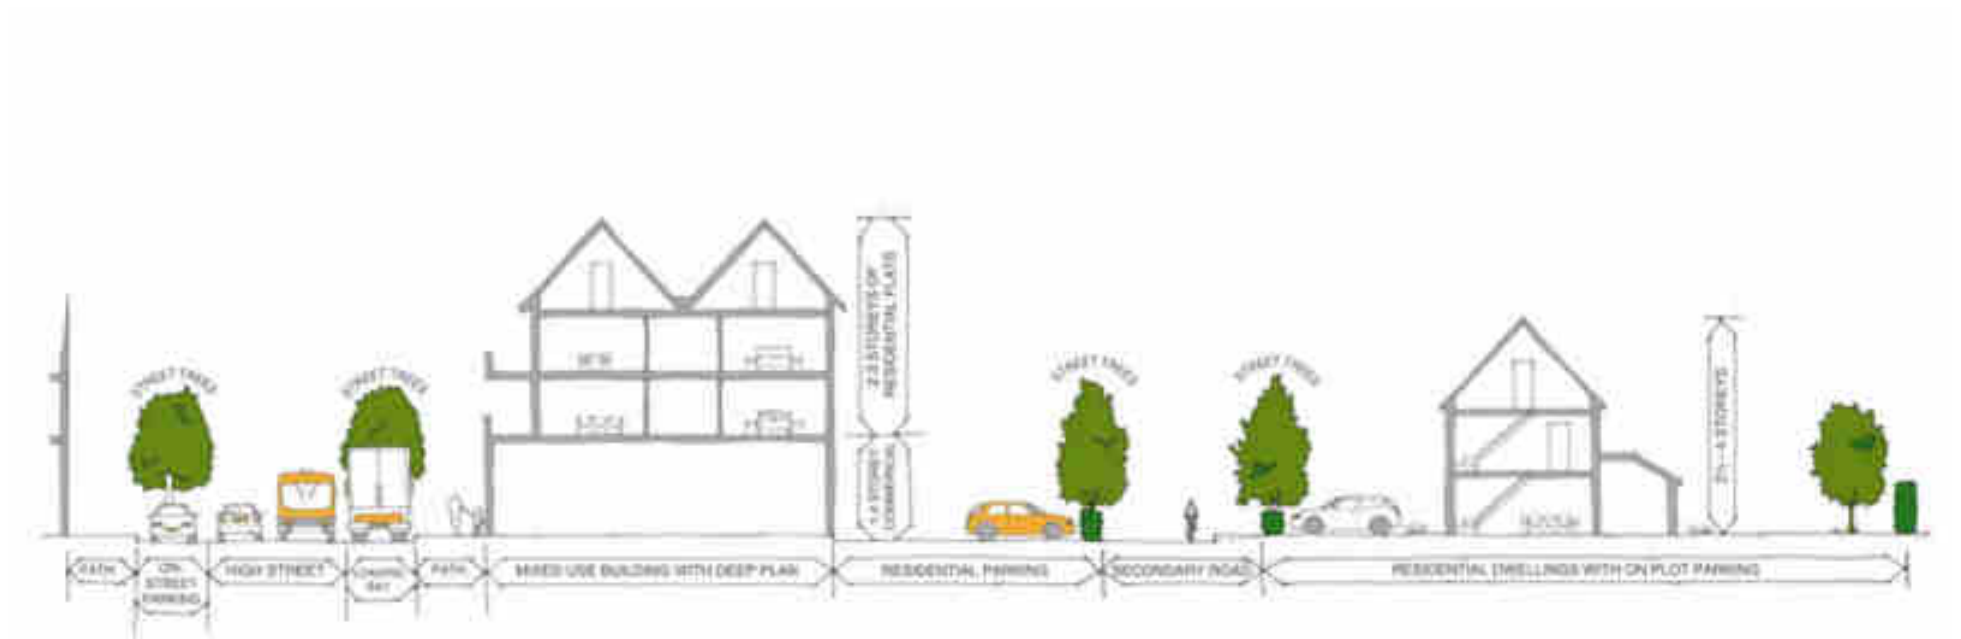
High Street densification: a typical approach to redevelopment of deep plan sites with high street frontage
